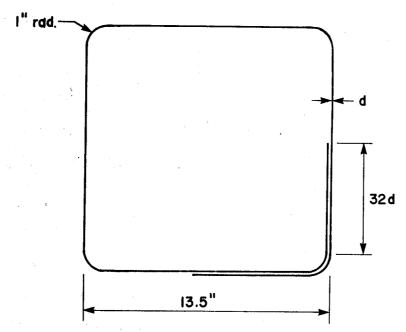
'Tie Details for #9 Wire and 3/16 in. Diameter Ties
